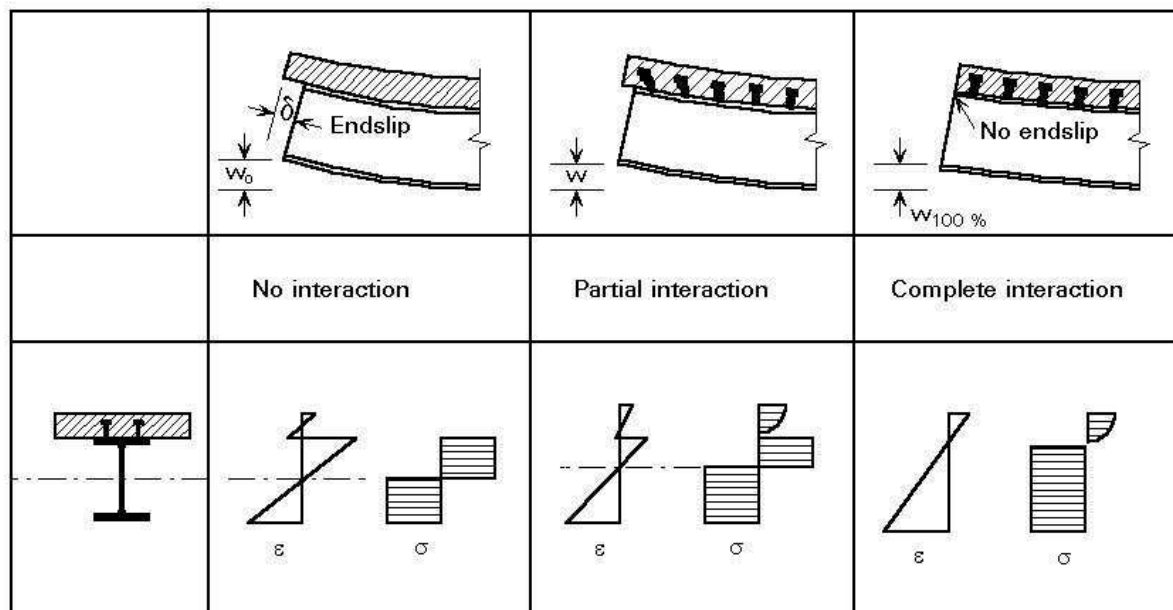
Composite Steel Beams-Concrete Slab Interaction
